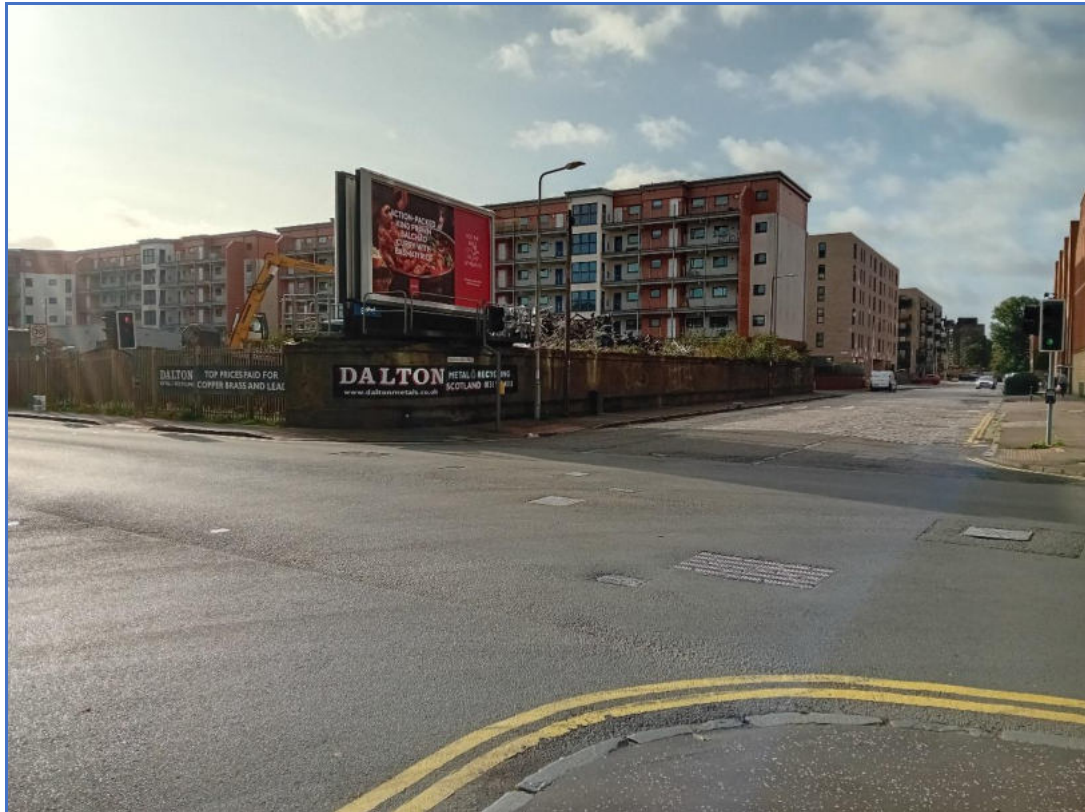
View of the Site from the corner of Salamander Street and Bath Road, showing the section of wall running along the Site's western boundary (photo looking southeast).
